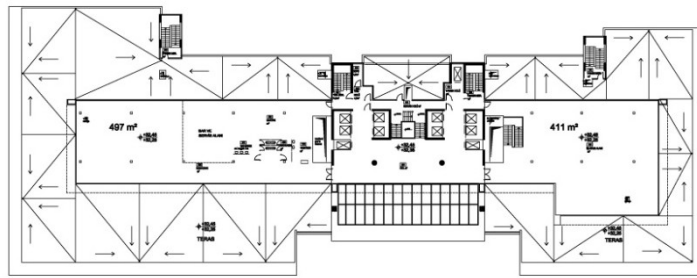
AKPLAZA, Roof floor plan⁶⁵
